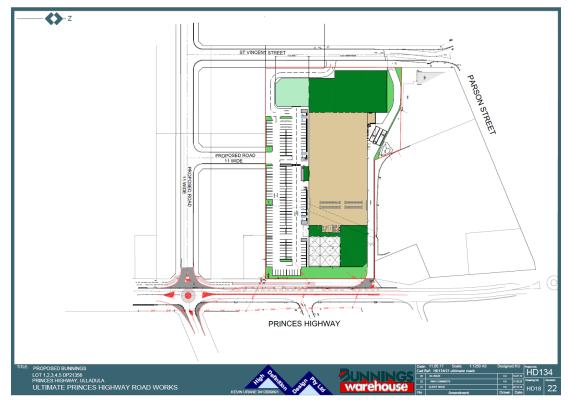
Ultimate access arrangements for patrons off future link road between St Vincent Street and the new roundabout on the Princes Highway.
